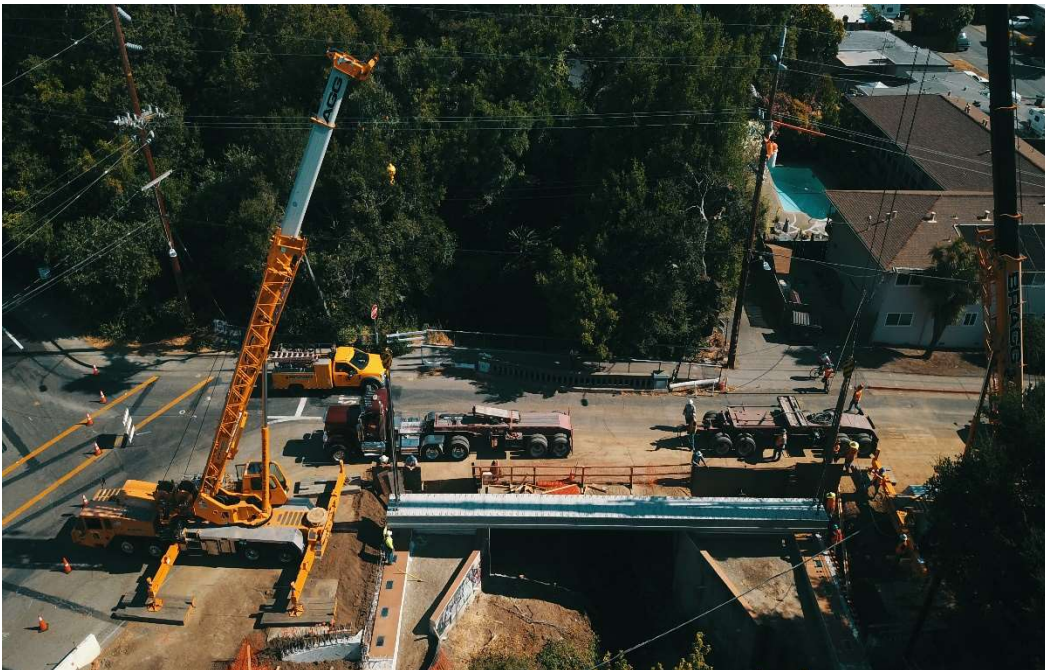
Drone Photograph of Precast Deck Unit Placement.
